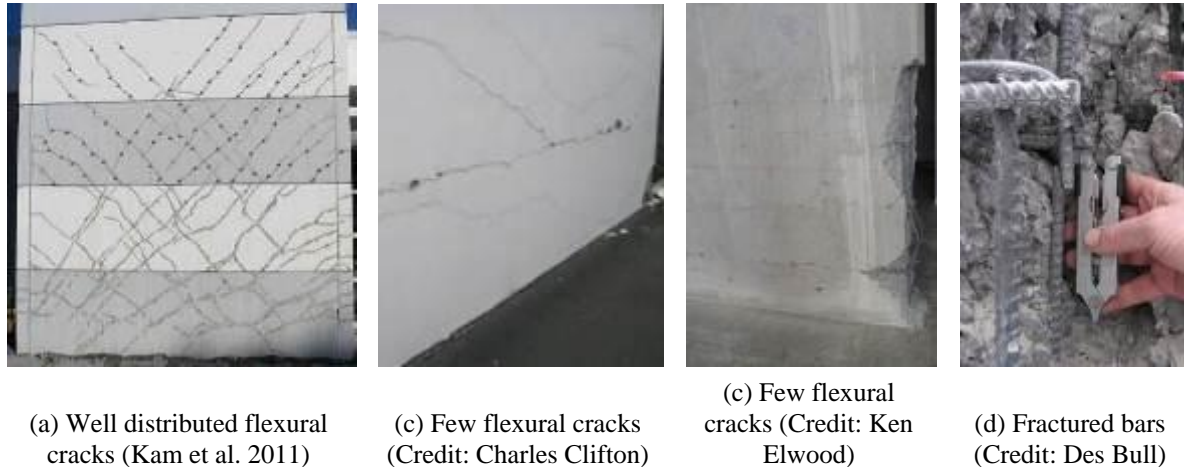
Examples of observed damage to well detailed and lightly reinforced concrete walls
